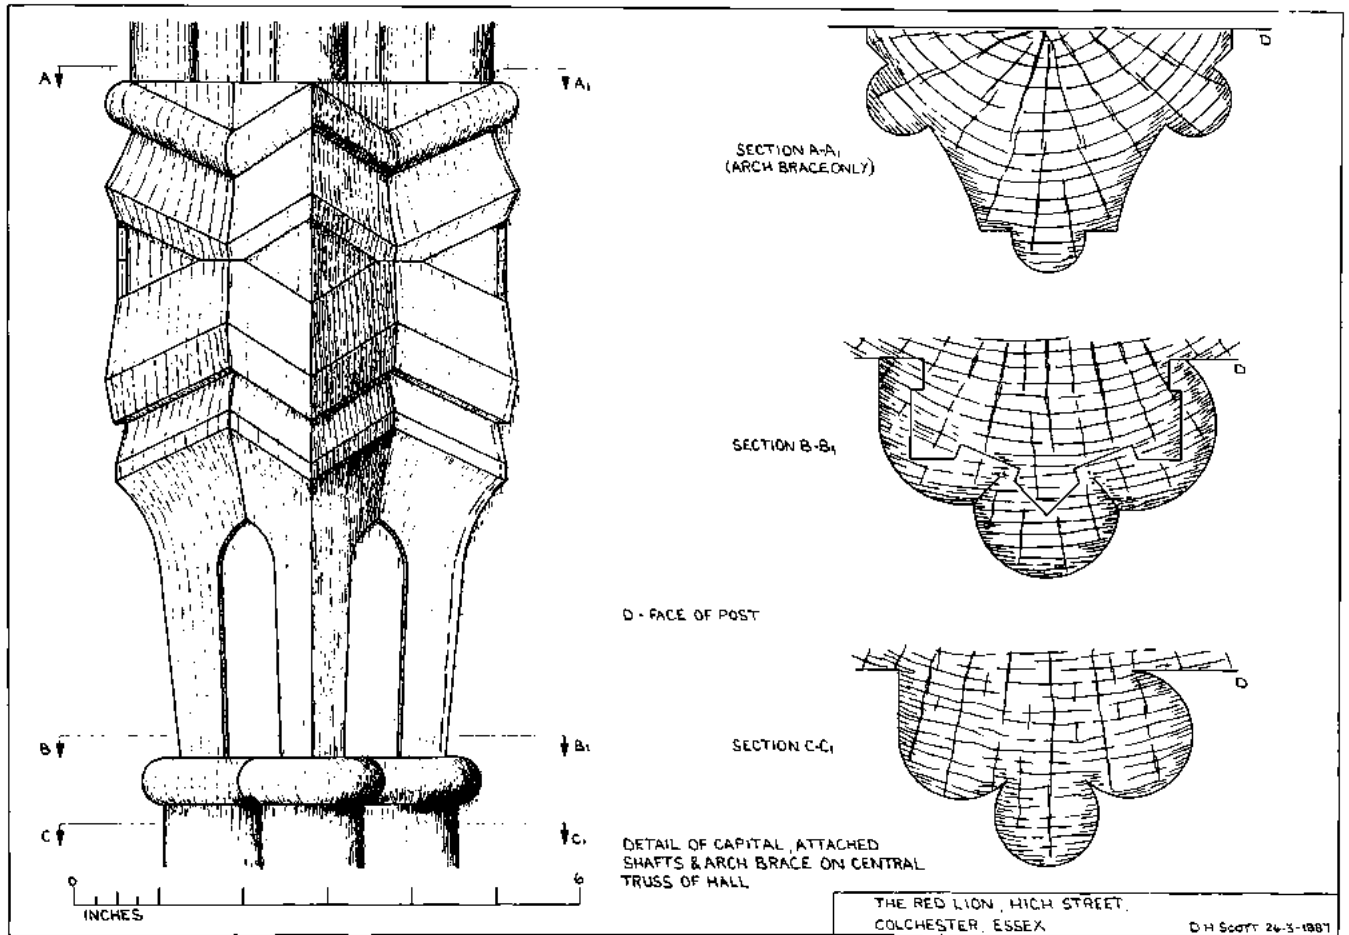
The Red Lion, Colchester. Detail of capital, attached shafts and arch brace on central truss of hall.
